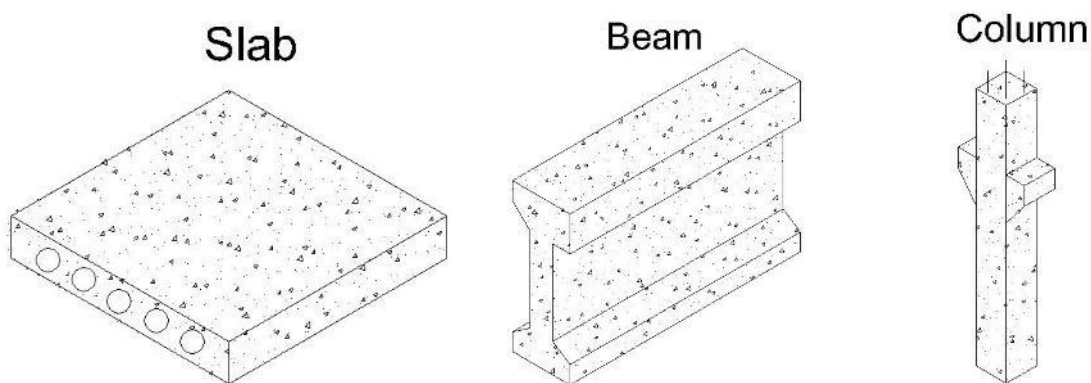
Typical components of precast concrete (Slab, beam, column)
